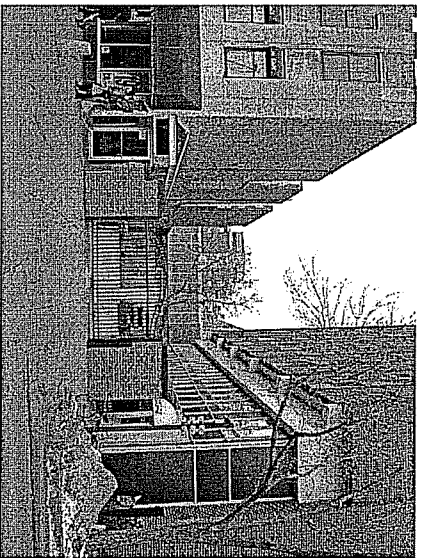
View looking southwest to Hotel, Hillel & Residential Buildings
